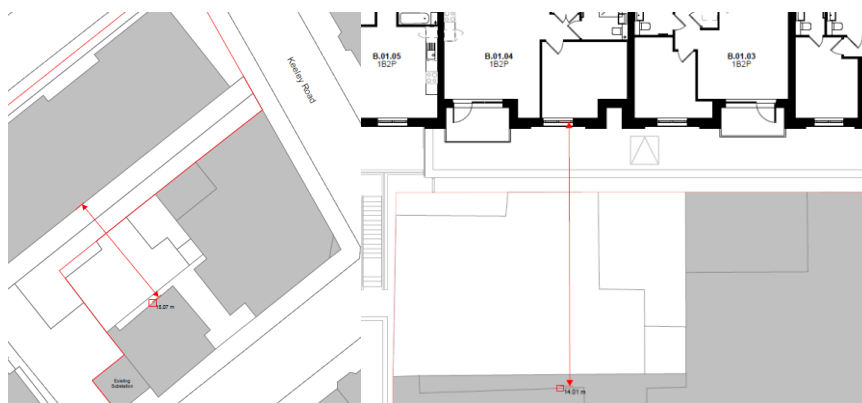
and 63: relationship between existing building and Keeley House close up (left) and at a distance (right)
